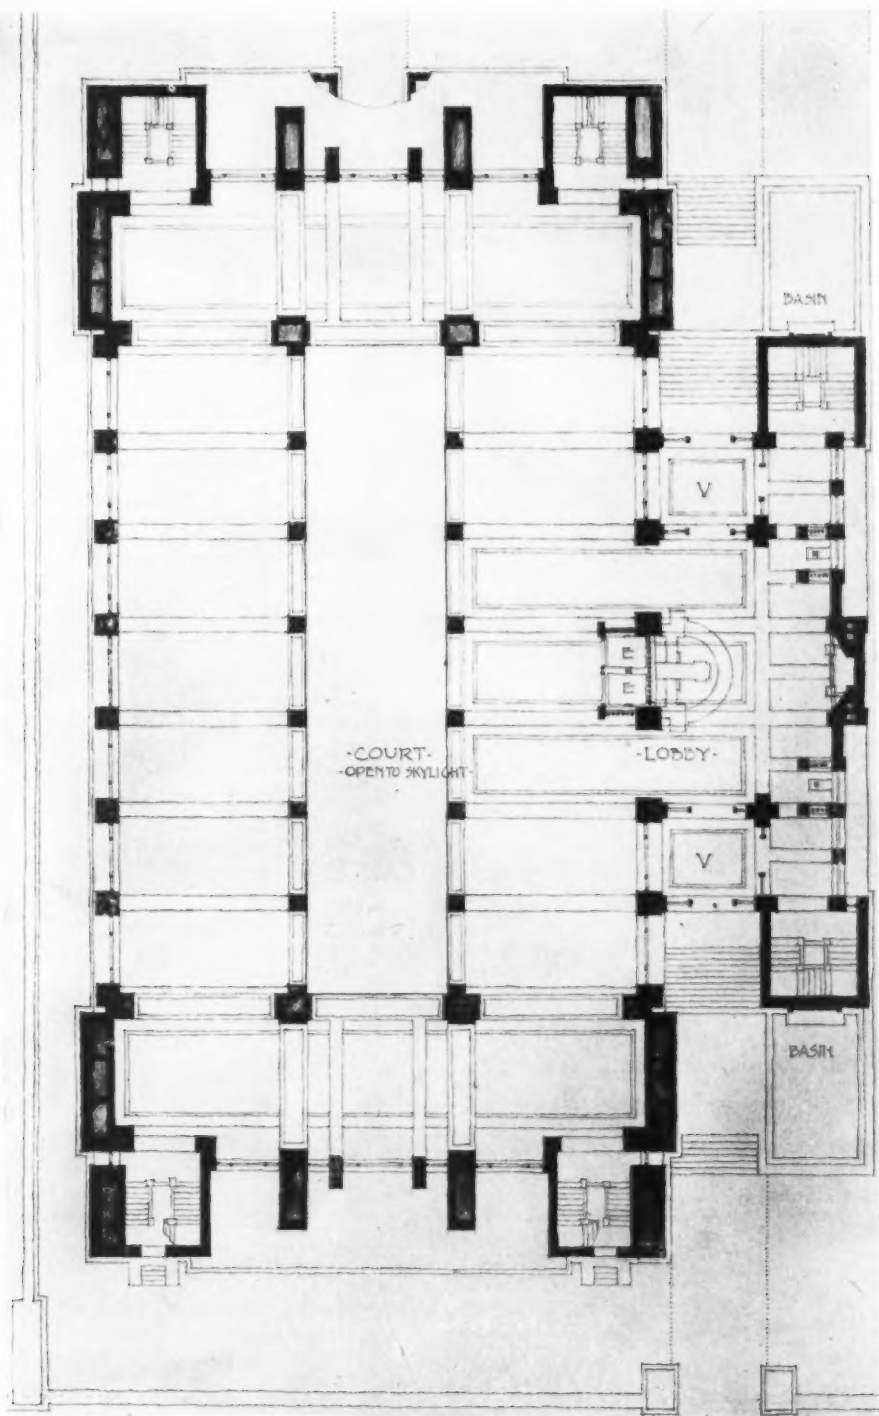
LARKIN BUILDING—MAIN FLOOR PLAN.
